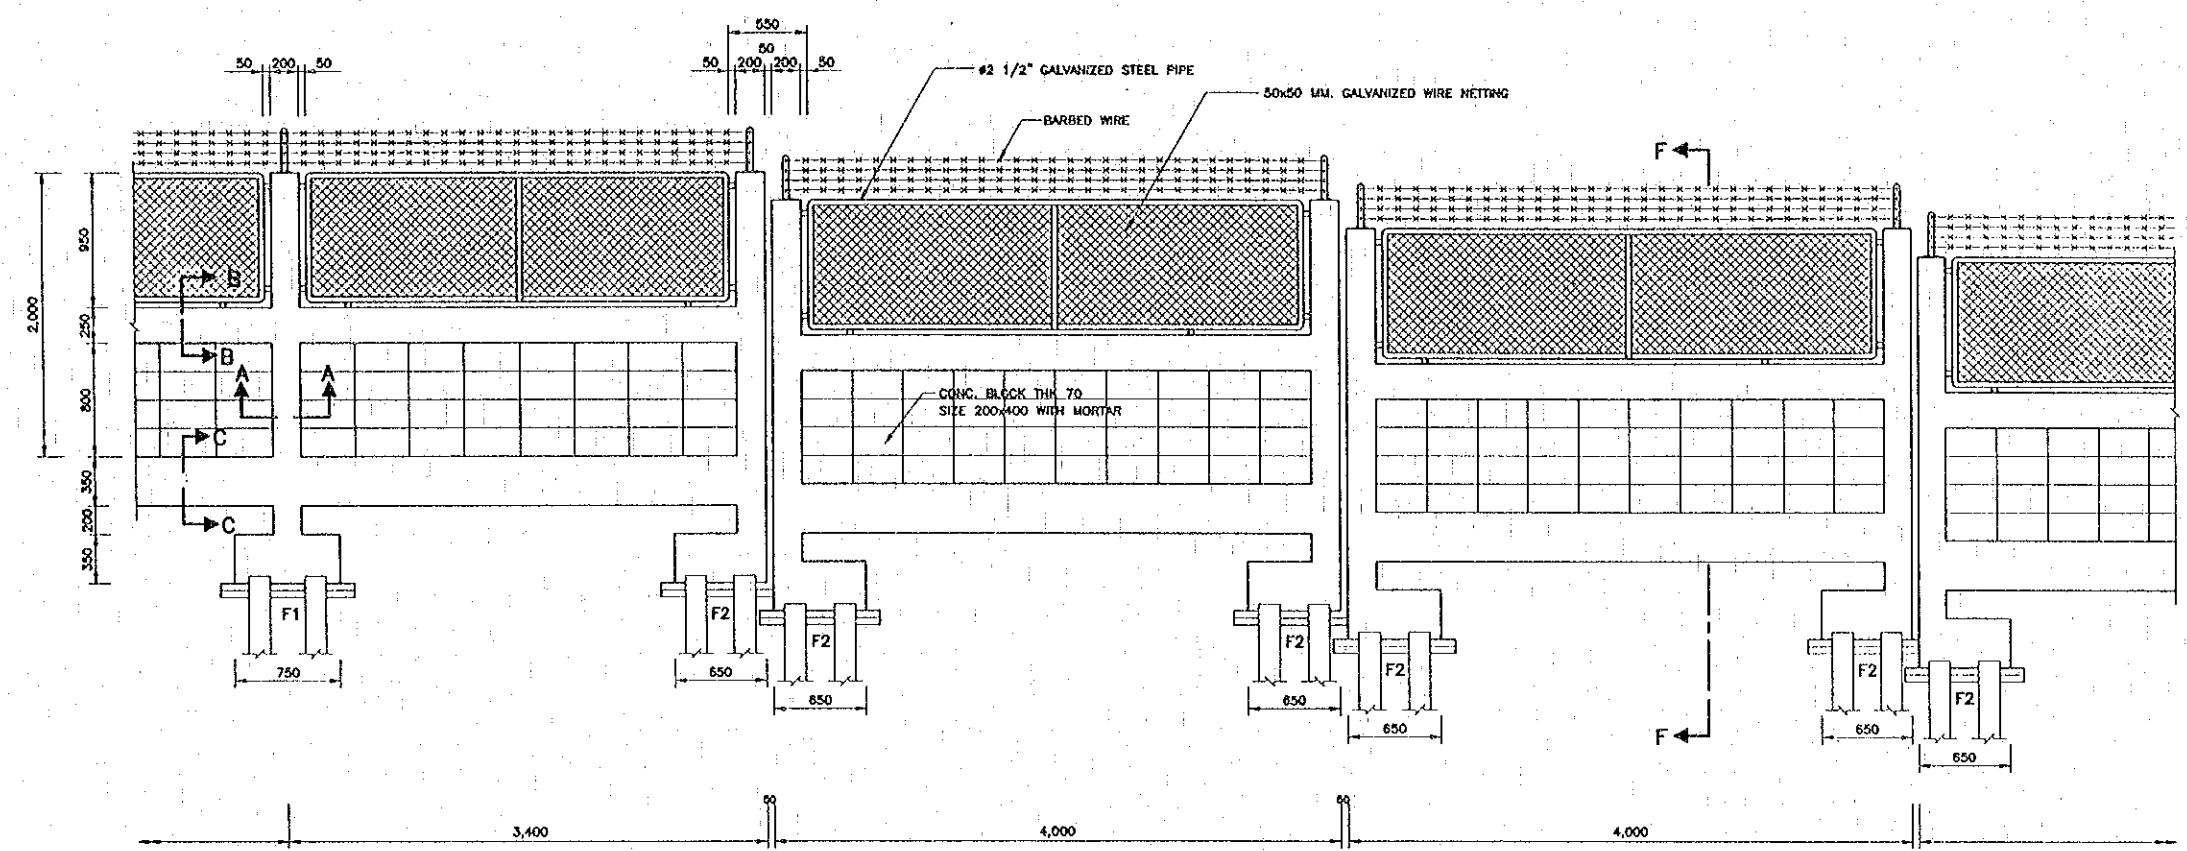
DETAIL OF INSTALLATION CONCRETE BLOCK METHOD
